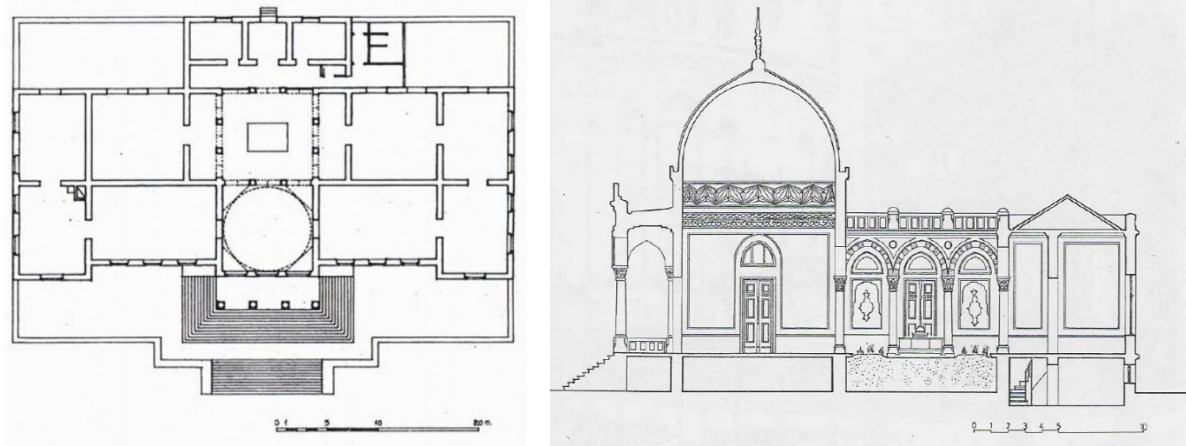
Ethnography Museum plan and facade (Sözen, 1984)
